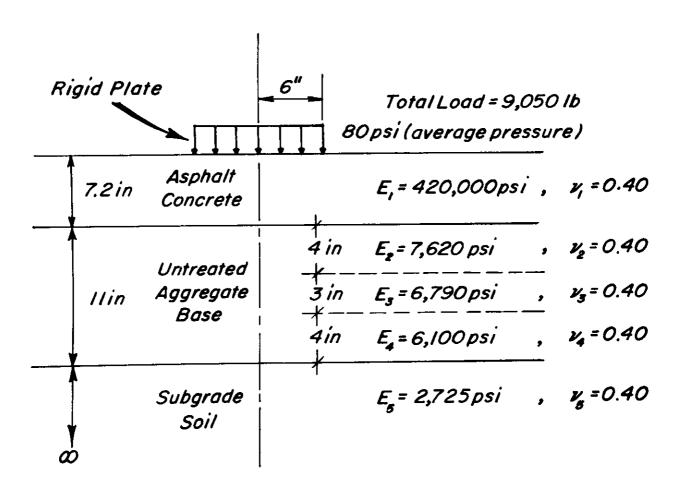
Characterization of 7.2-in. thick asphalt concrete pavement section (Section 4) as a five-layer elastic system.
